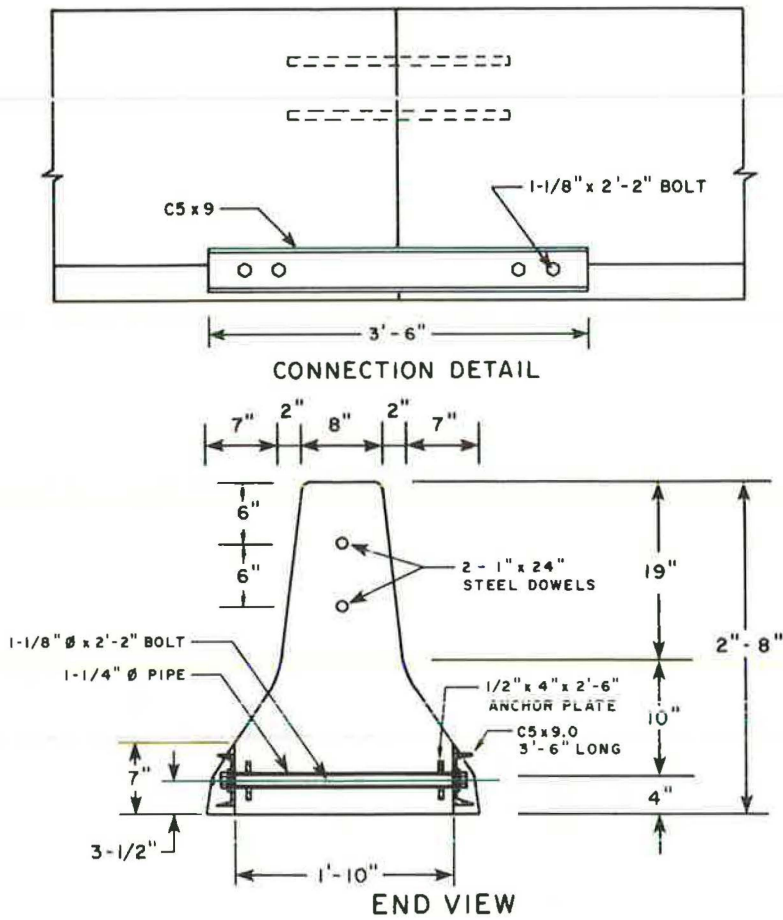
Side plate or side channels with steel dowel shear connection (channel splice).
